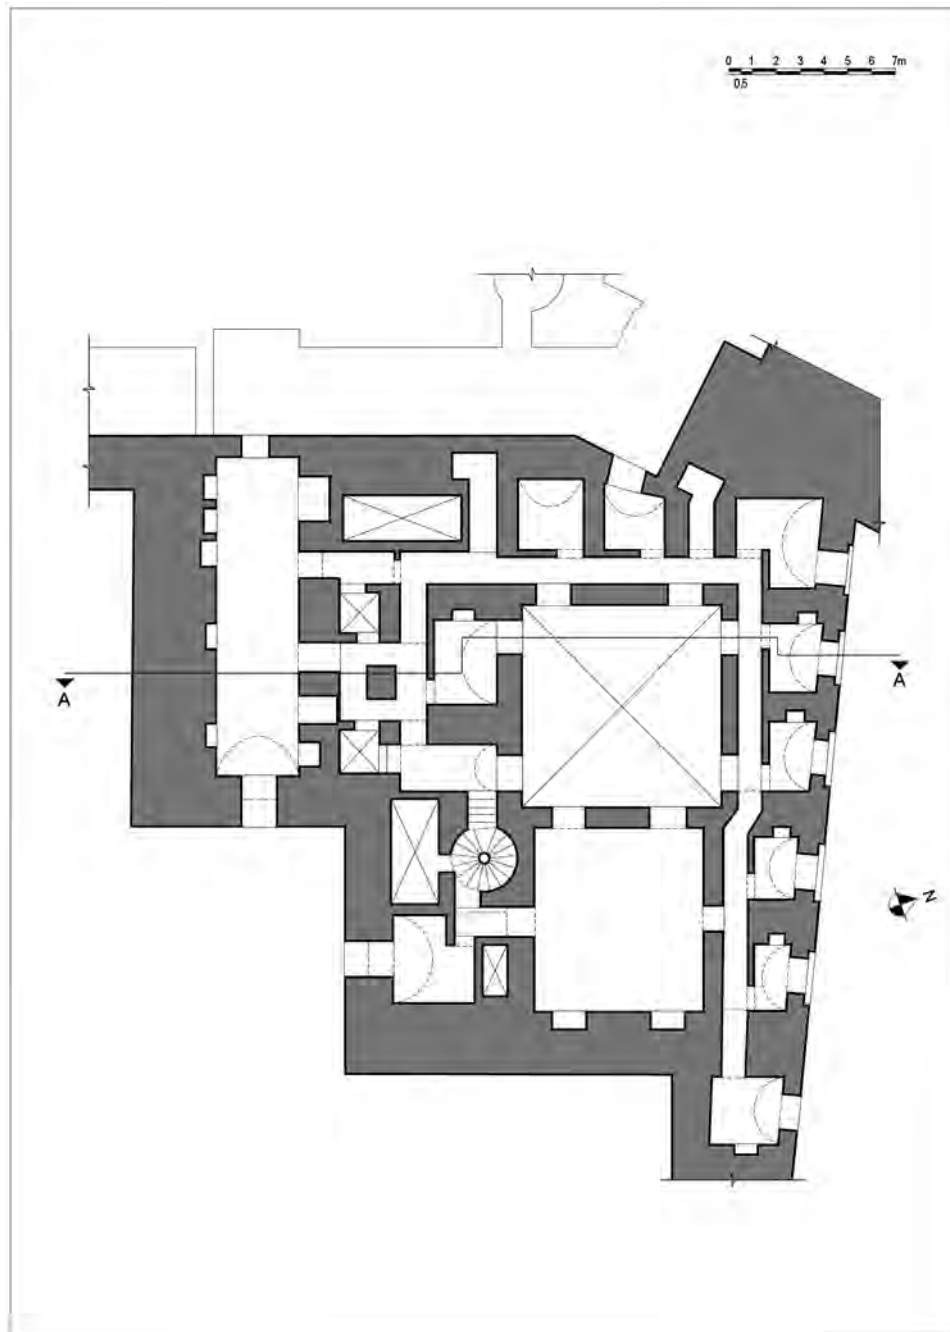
Mālīkiyah Madrasah, Complex of Sultan Ḥasan, Cairo, third floor plan (H. Al-Harithy)
